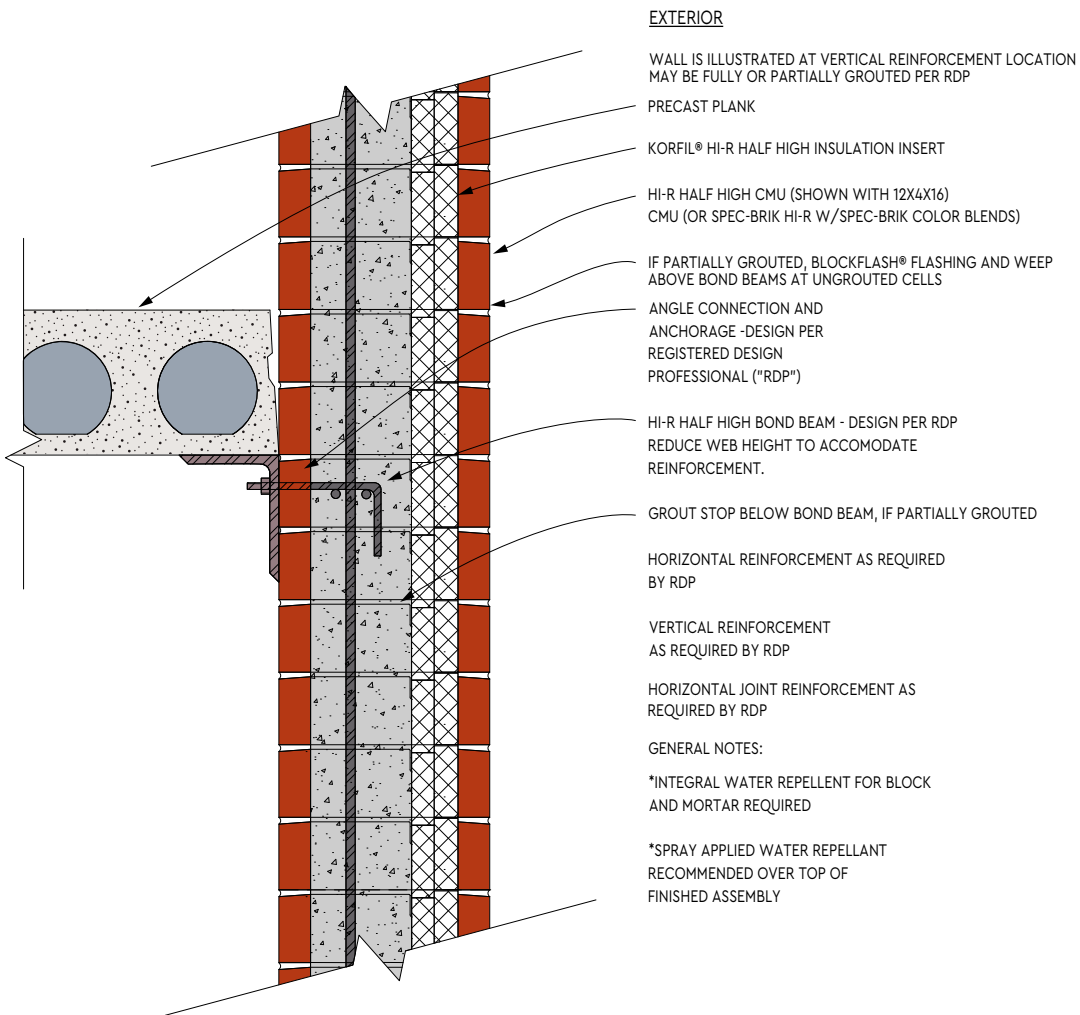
HI-R Half High Plank at Non-Bearing Wall Fully Grouted
